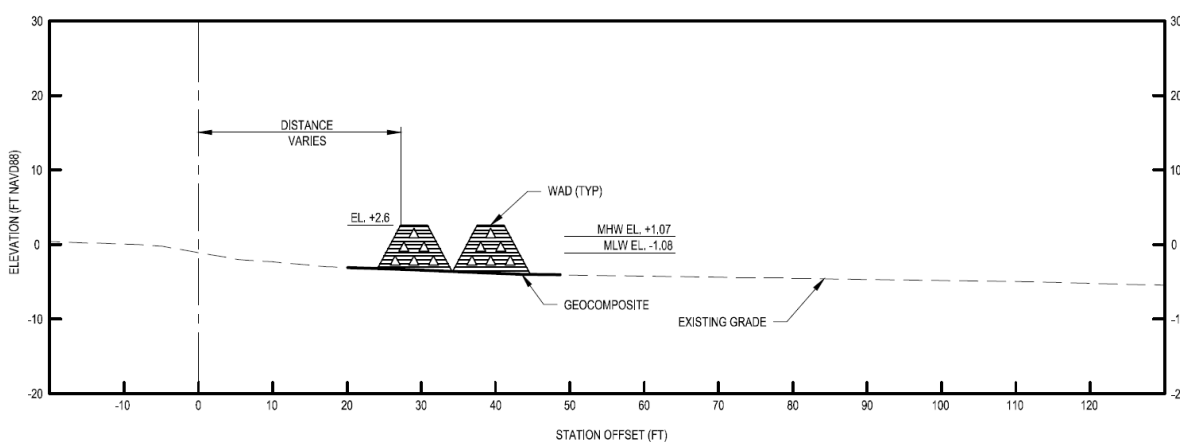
Typical Section of a Wave Attenuation Structure at Alignment C
